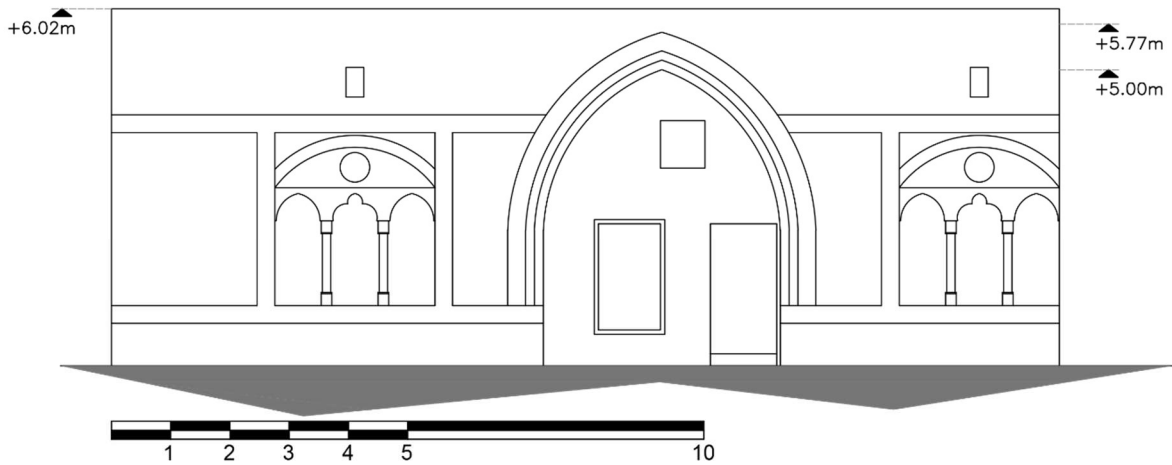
South-West Technical Elevation of Mokhtara Vaulted Roof Liwan House, Source: Author
